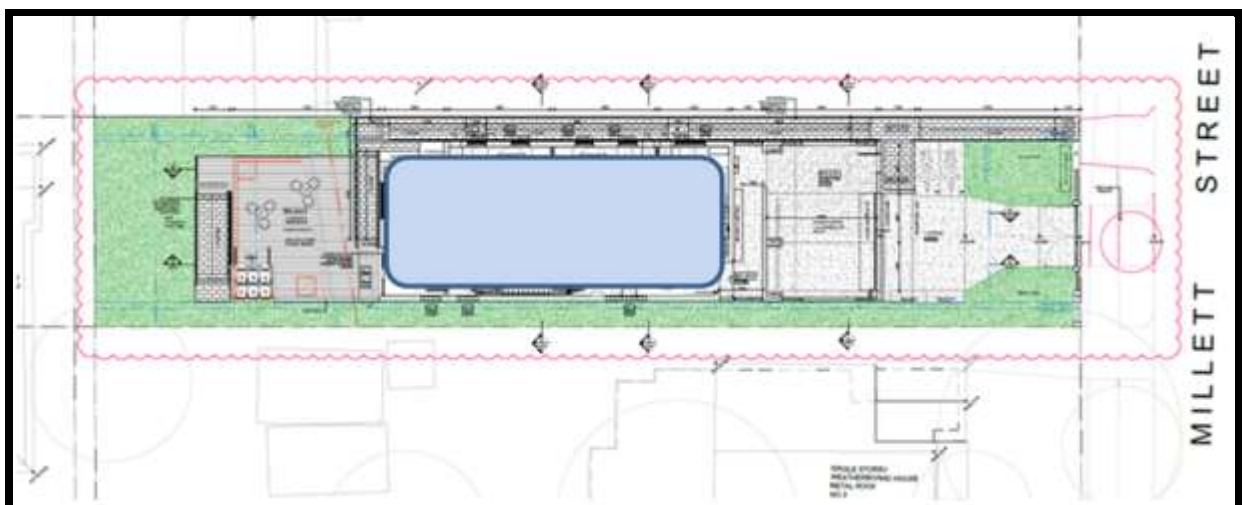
Site Plan at 5 Millett Street Hurstville (Source – Play Co Architects)
